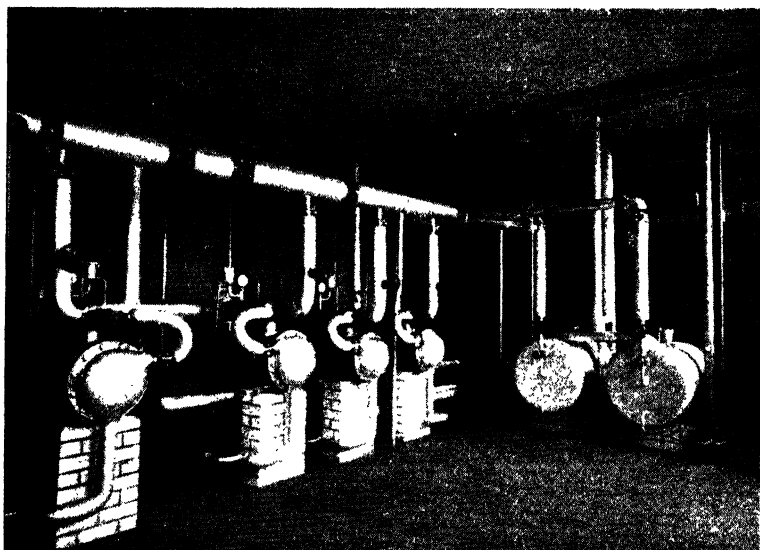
CALORIFIER HOUSE FOR LARGE OFFICE BUILDING
